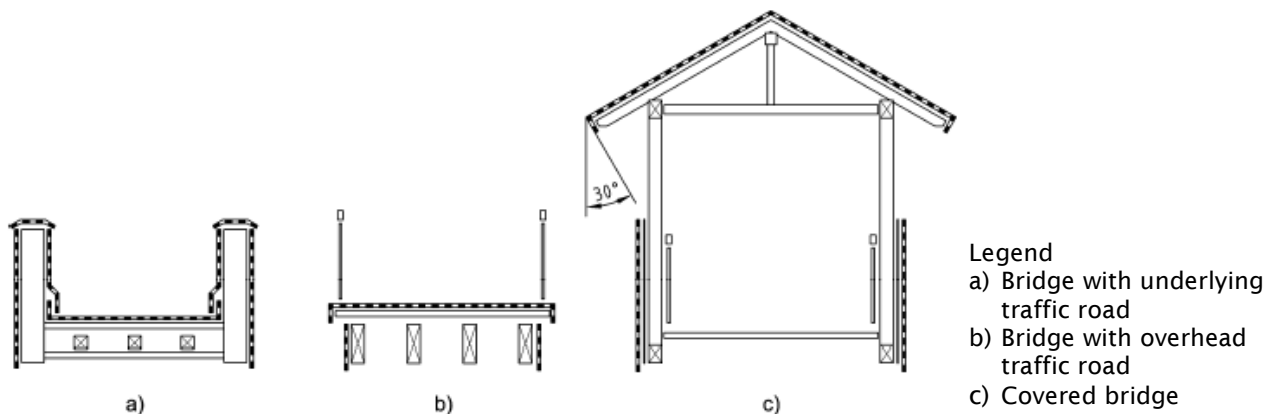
Structural classification of timber bridges, protected bridges according to DIN EN 1995-2/NA:2011
